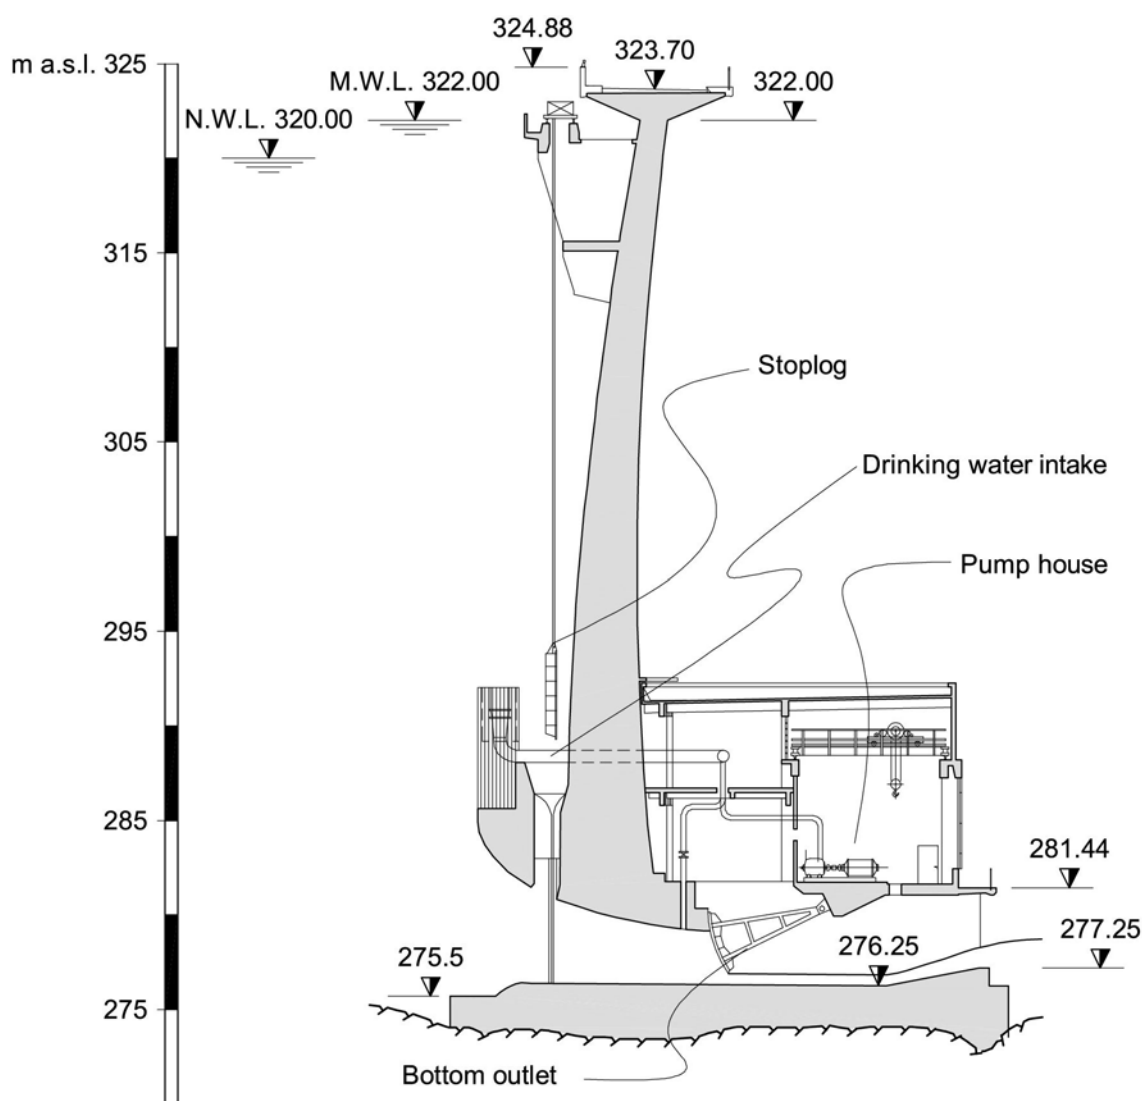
Central cross section of the Esch-sur-Sûre dam.
